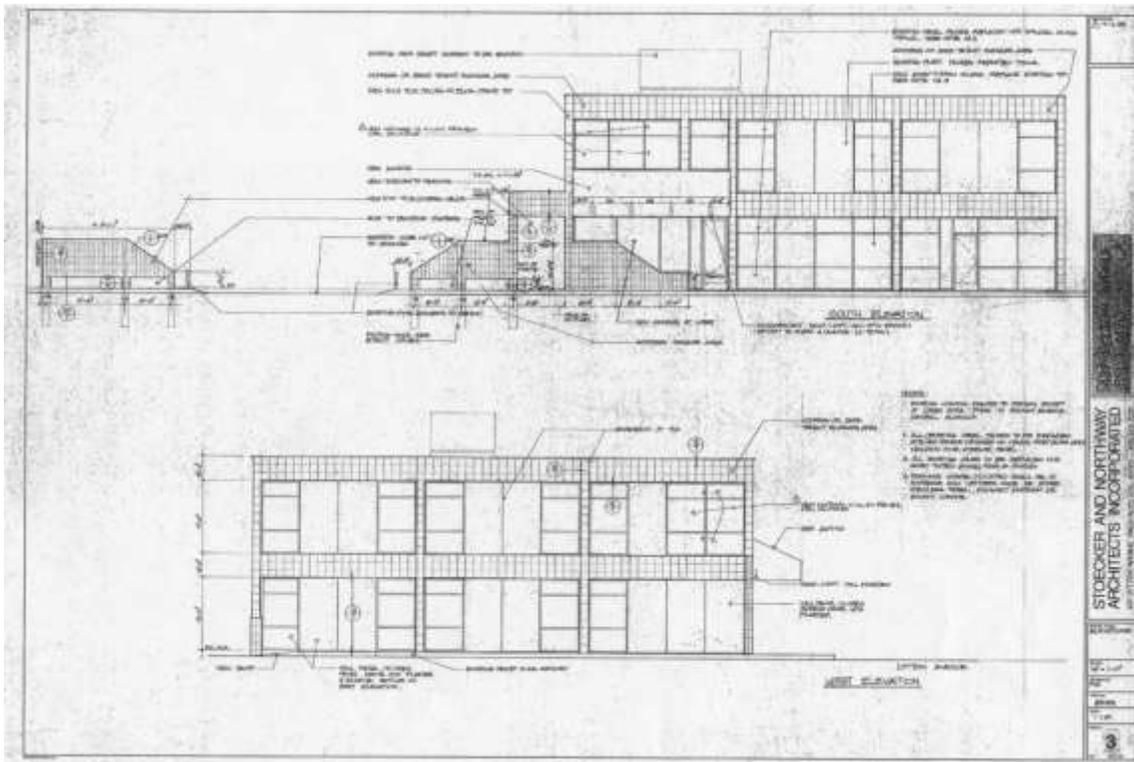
Lytton Avenue and Parking Lot Elevations from the 1985 alterations drawings. (From the building file in the Planning and Community Environment Department).
